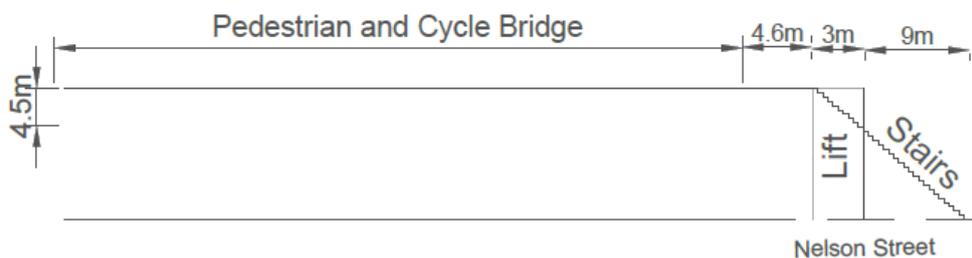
Nelson Street Stairs and Lift option – longitudinal cross section
